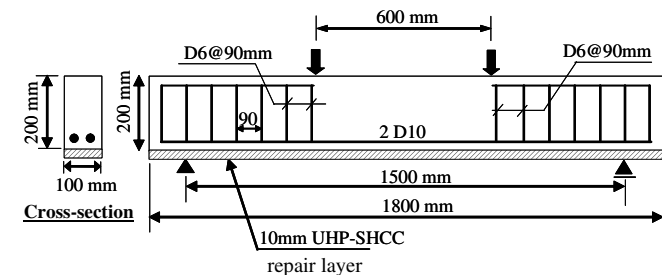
Reinforcement details of repaired RC beams and test setup.
